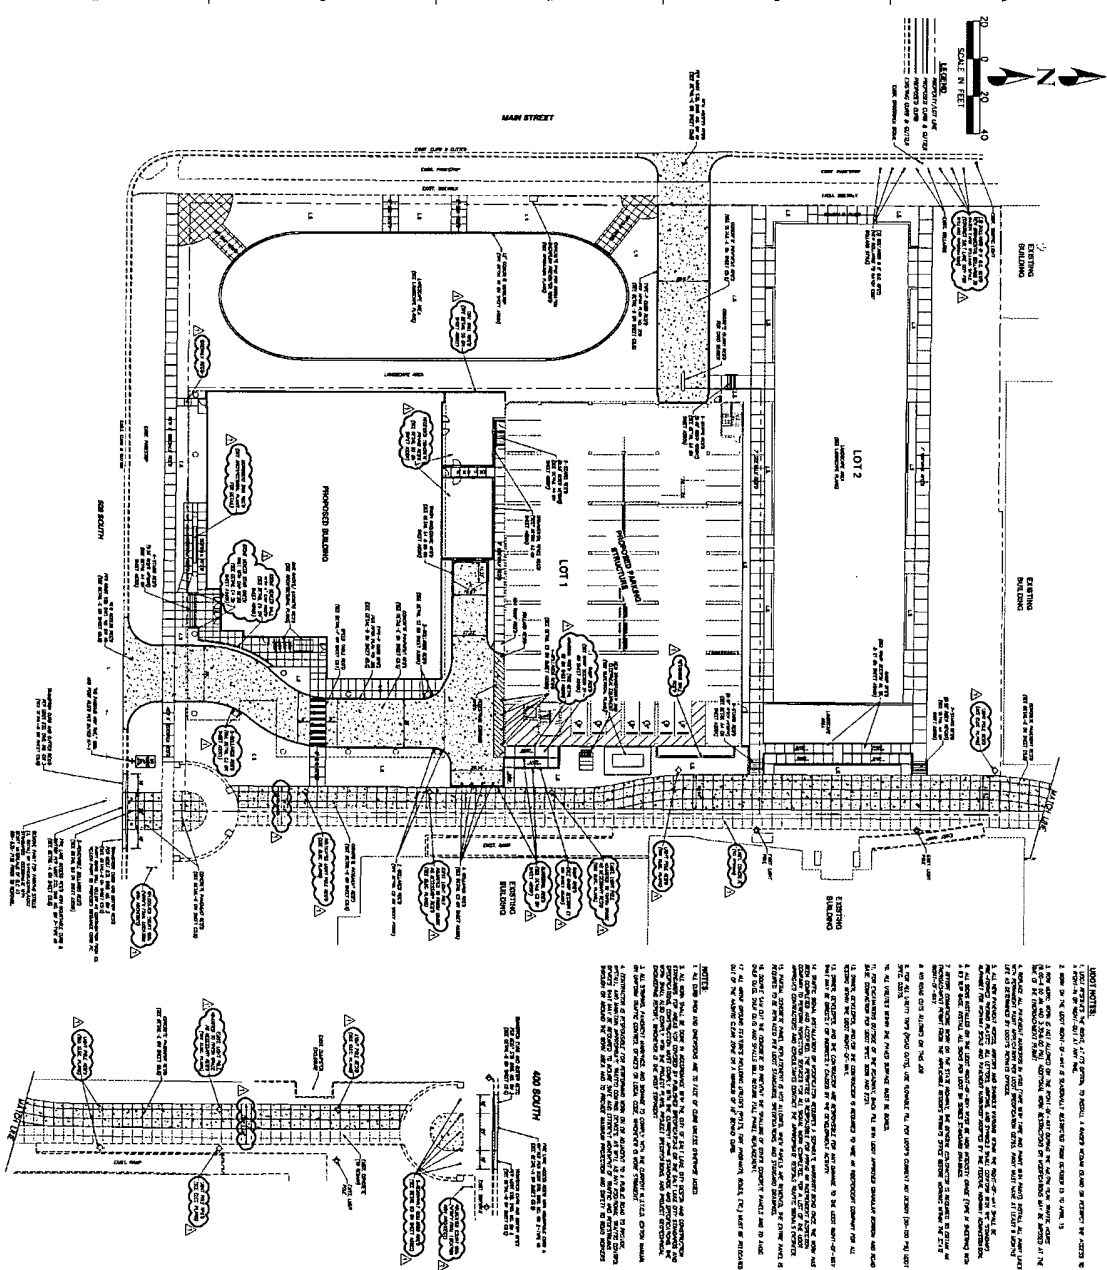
EXHIBIT "G" SITE PLAN INCLUDING MUTUAL USE EASEMENT
